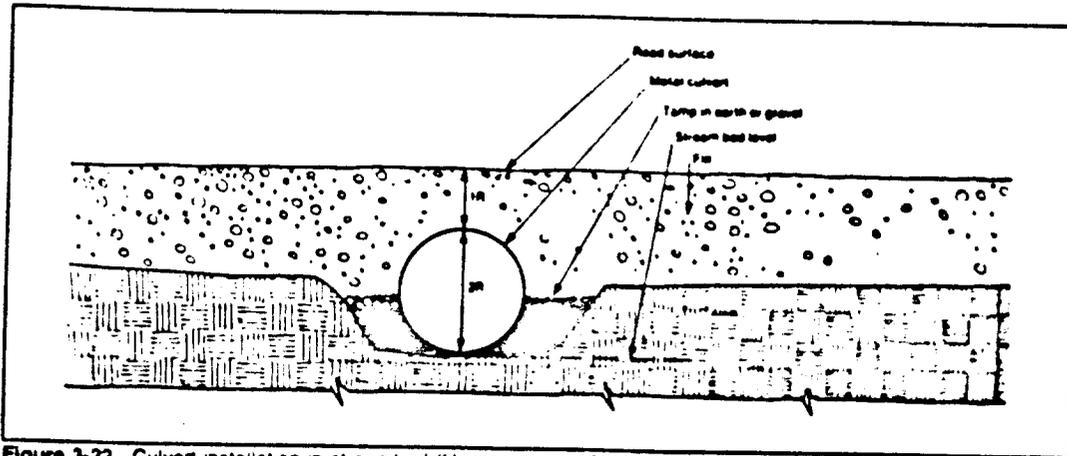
Culvert installation in streambed (Hynson et al., 1982).
